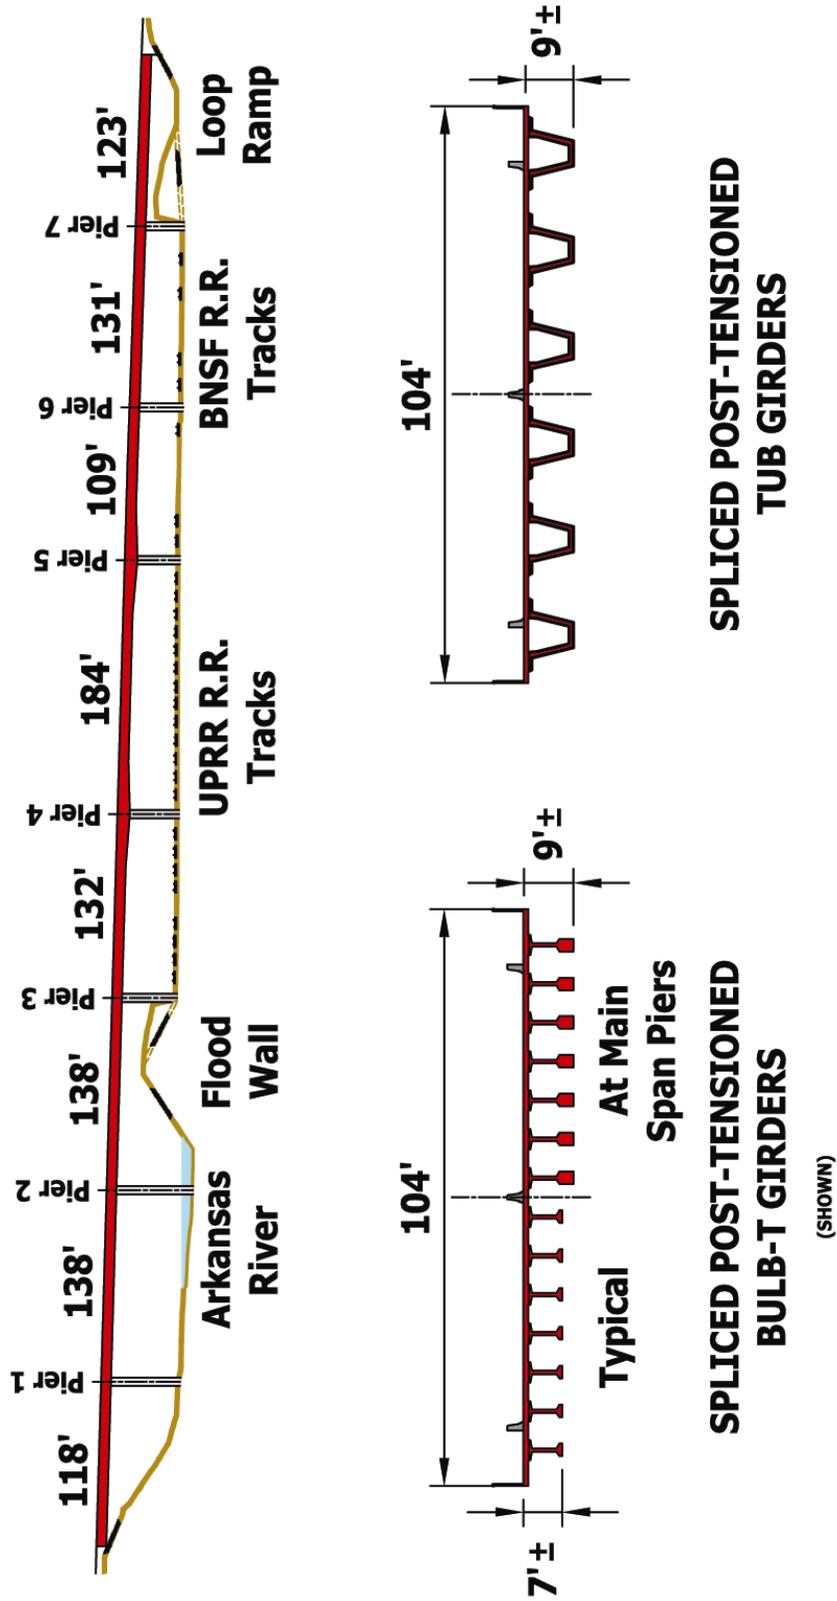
Match Existing RR Spans w/ Modified River Spans - Elevation
